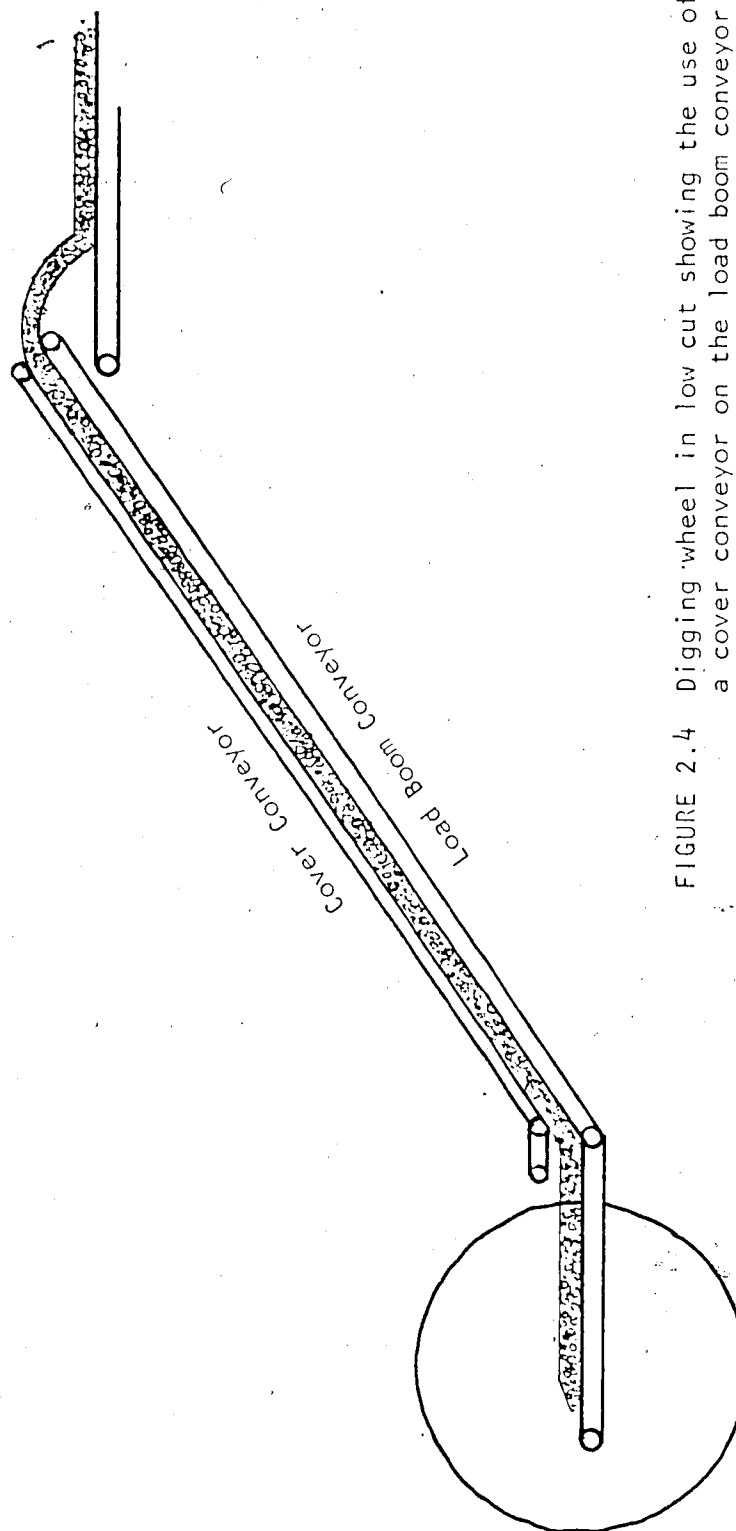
Digging wheel in low cut showing the use of a cover conveyor on the load boom conveyor
